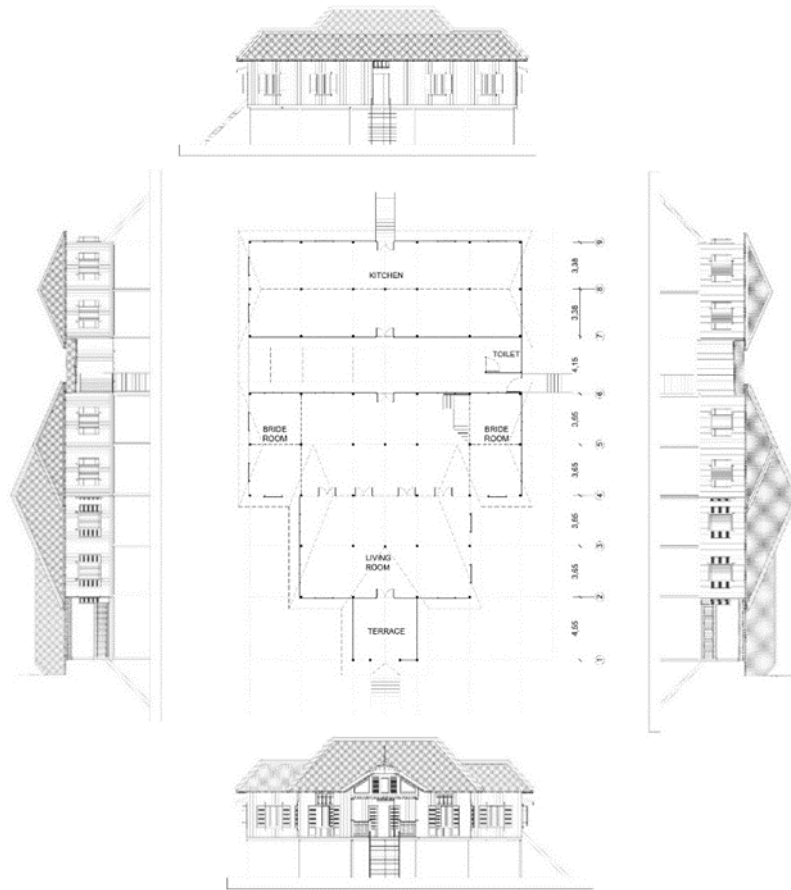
Floor Plan and Views of the Hajjah Salmah House for Reconstruction
